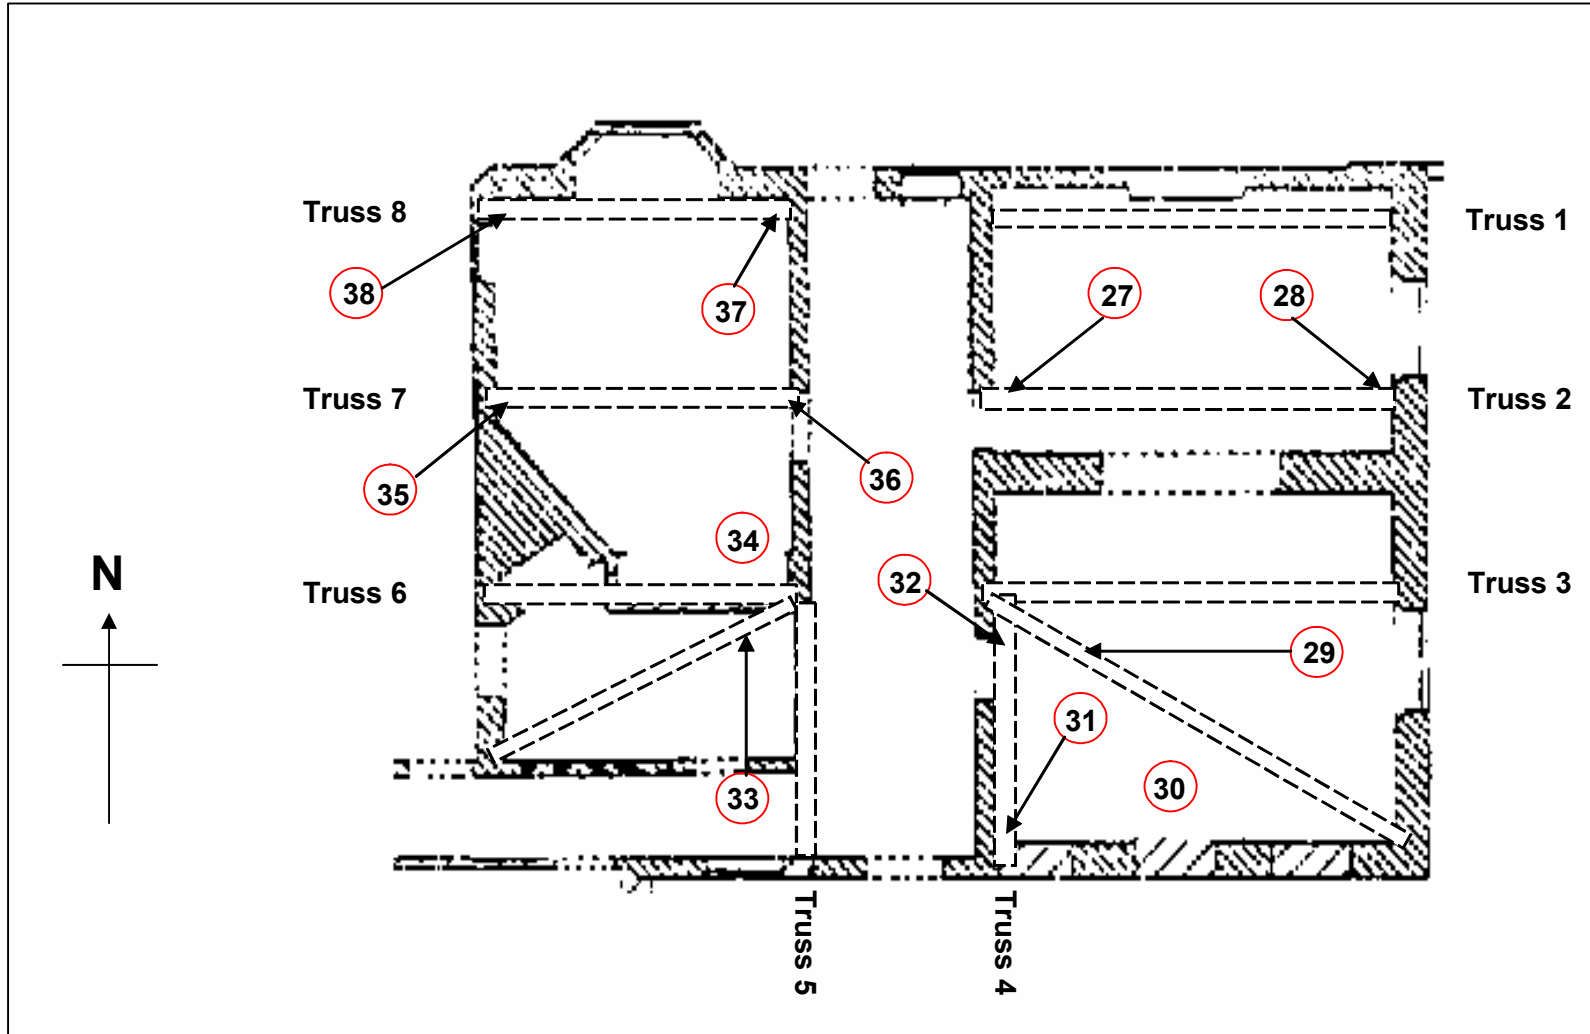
Plan to show location of samples from the roof of the garden wing (after Nicholas Molyneux)
